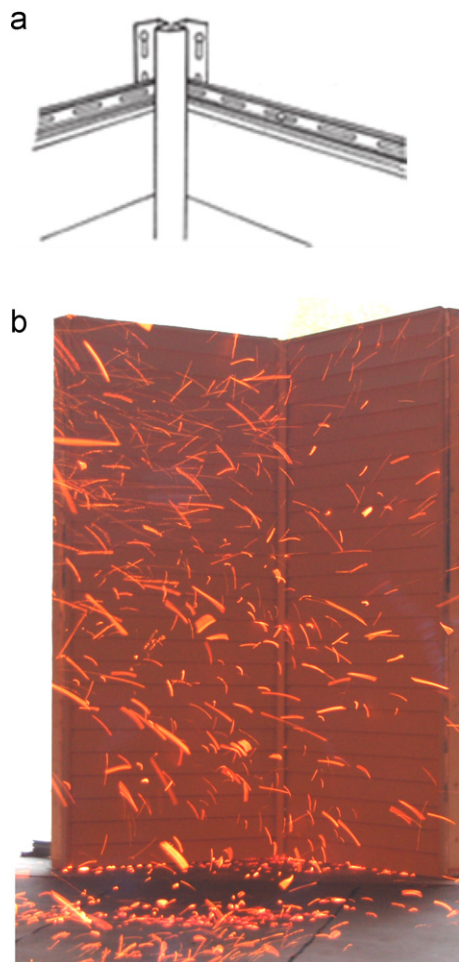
(a) Drawing of a corner post and (b) picture of vinyl siding reentrant corner assembly under firebrand bombardment [33]. The dimensions of each side of this assembly were 122 cm wide by 244 cm high.
